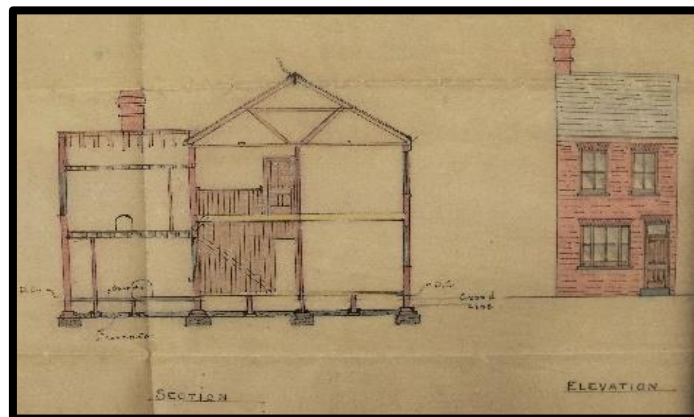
No. 16 Madras Road, proposed section and front elevation (CA CB/2/SE/3/9/3243)
